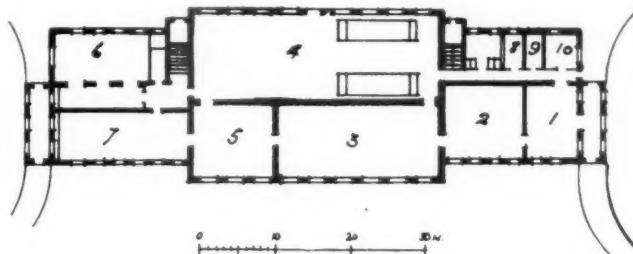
GROUND FLOOR PLAN OF THE LAUNDRY BLOCK, THE VIRCHOW HOSPITAL, BERLIN.
